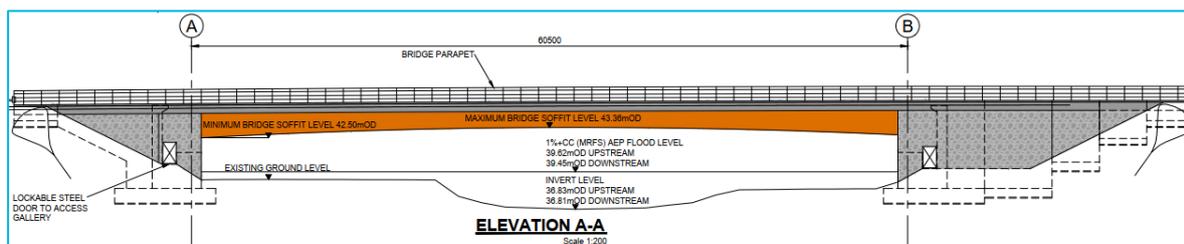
Proposed Bridge crossing of Abbert River - Elevation
